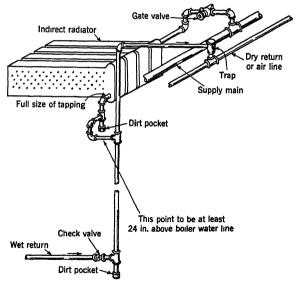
Typical Piping Connections to Concealed Heating Units with Wet Returns
